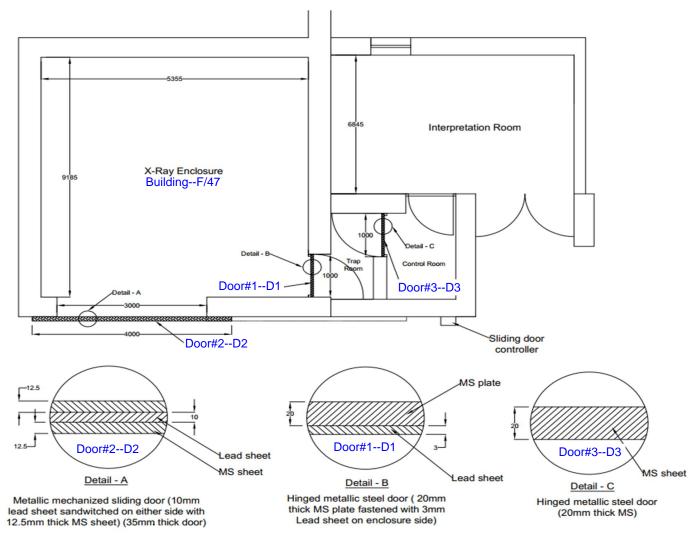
Schematic diagram of 3 Doors (D1, D2 & D3)—Location & cross sectional detail
